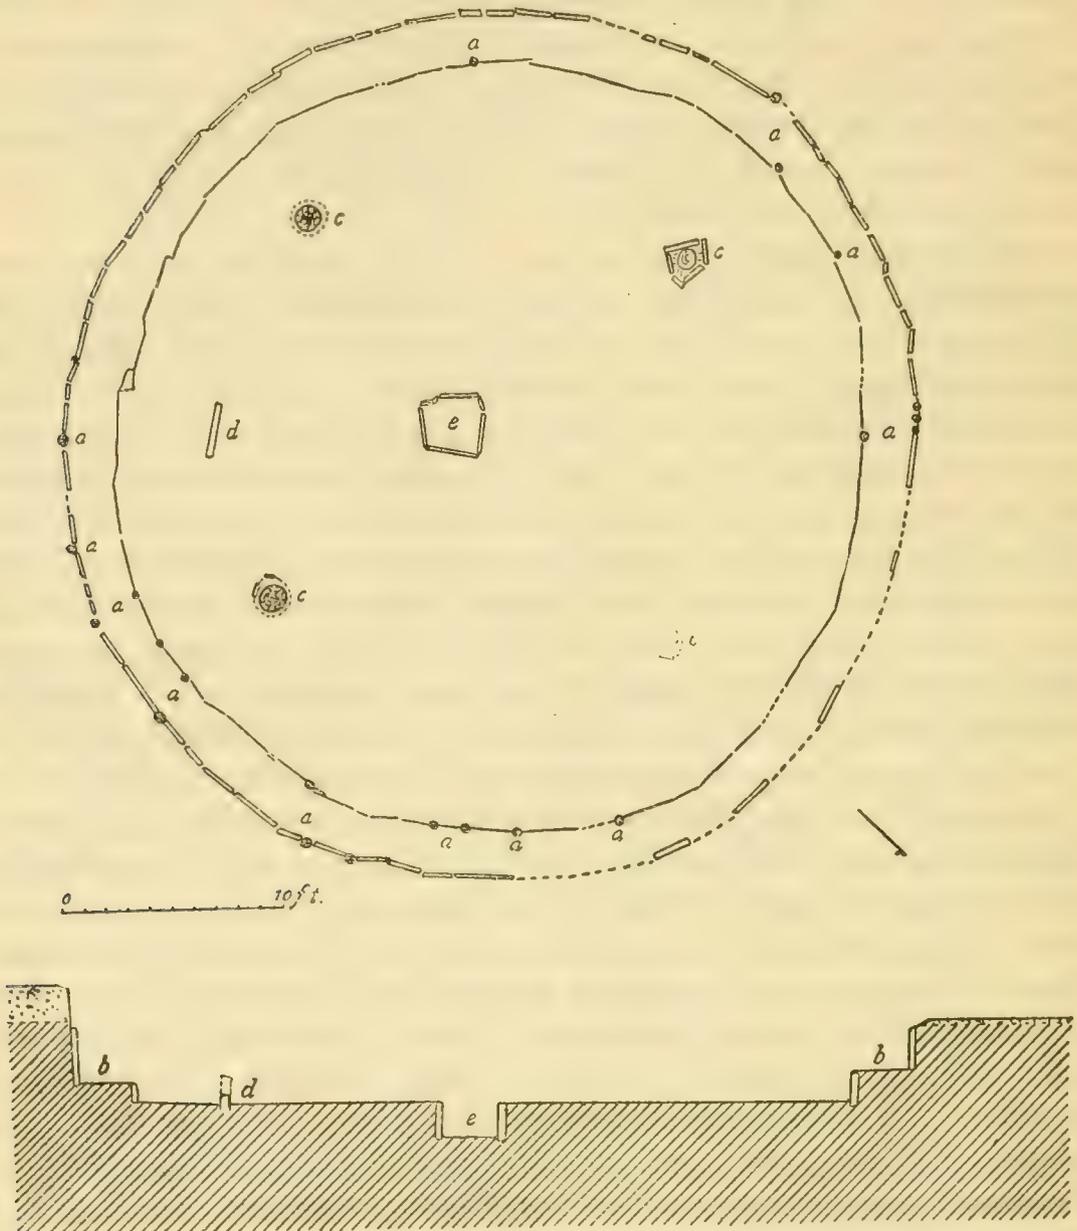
Plan of kiva. *a*, Posts in face of bench and back wall. *b*, Bench or banquette. *c*, Support posts. *d*, Deflector. *e* Fire pit
